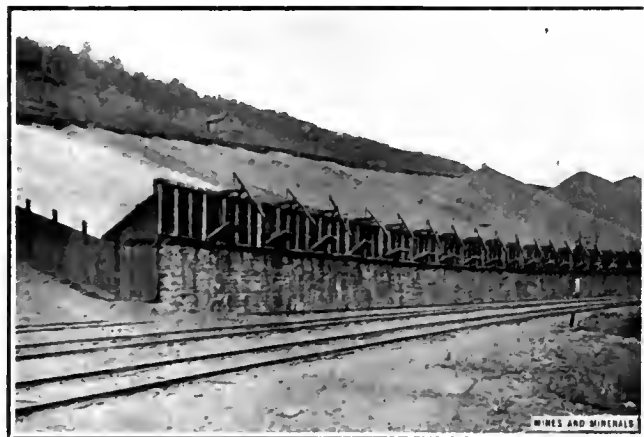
BUNKER HILL STORAGE PLANT, EMPTY
